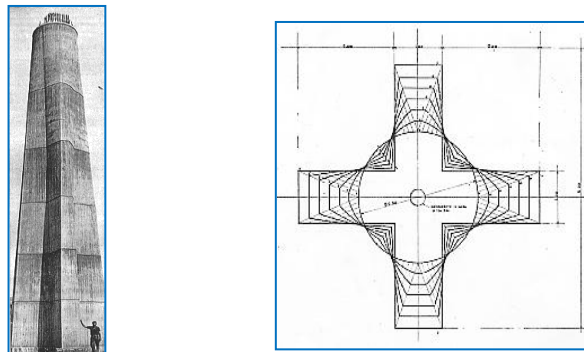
View of a column during the construction phases, and sequence of its geometrical sections
